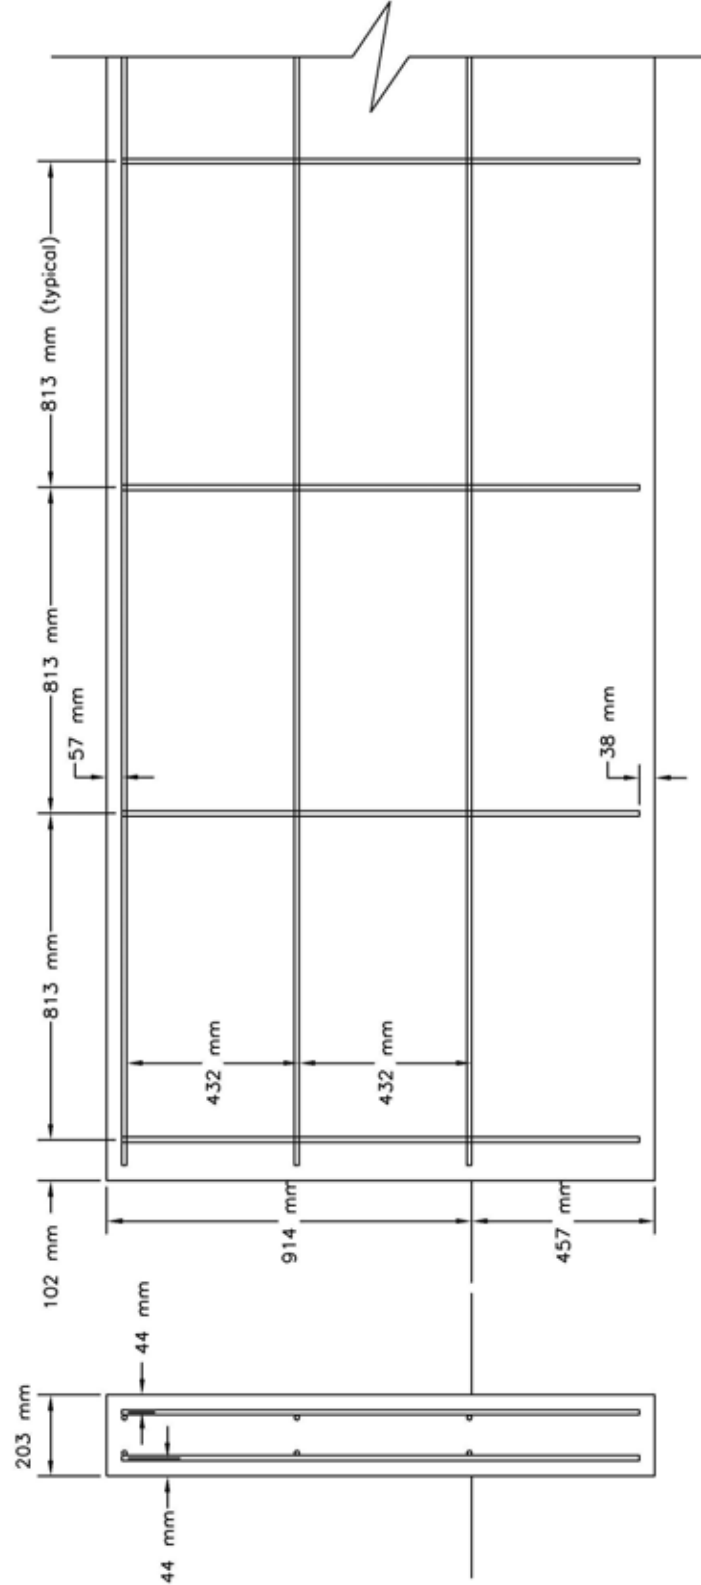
Concrete Culvert Substructure Details - Soil Retaining Wall For Test Purposes Only
